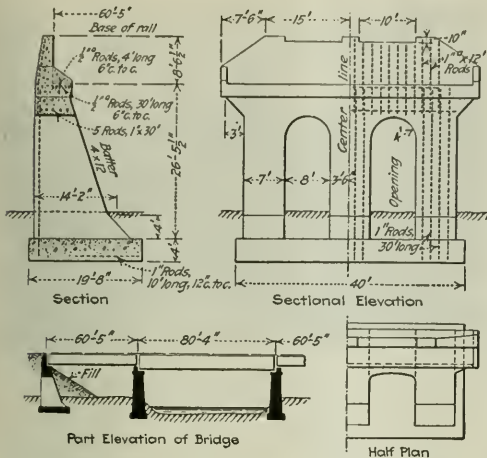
ABUTMENT WITH ARCHED OPENINGS
